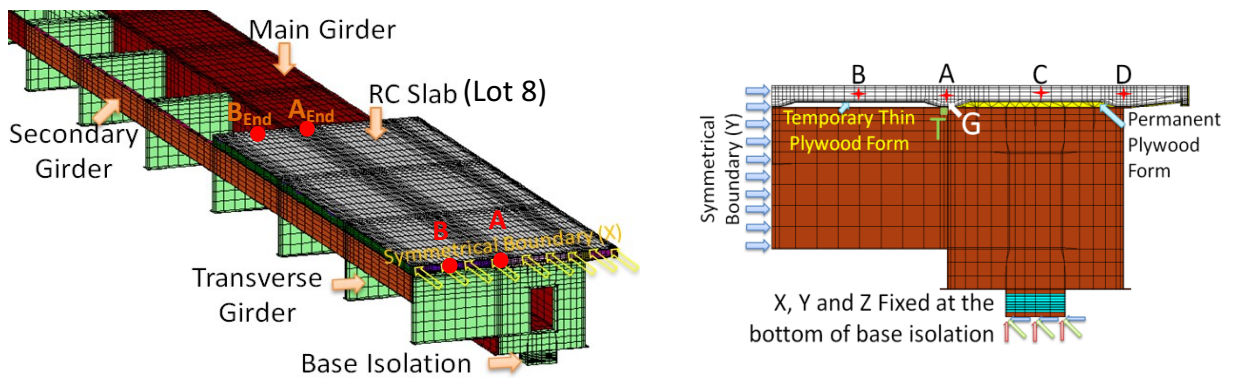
(c) Shinkesen Ohashi Bridge FEM 1/4th model considering concrete placement Lot 8 upon Pier 3
